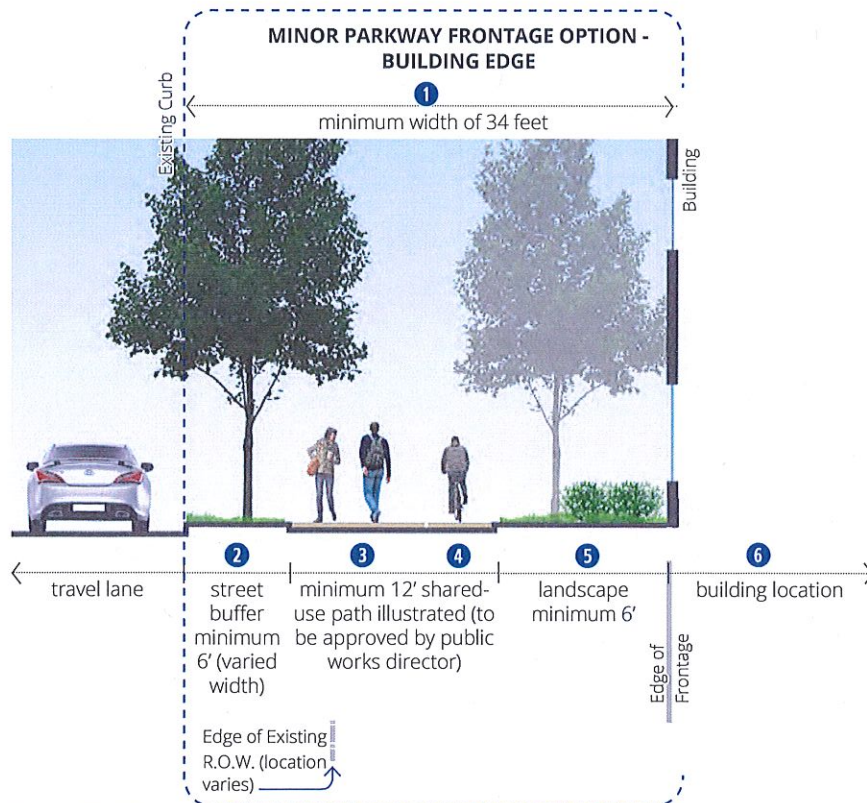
Minor Parkway Frontage Option - Building Edge
